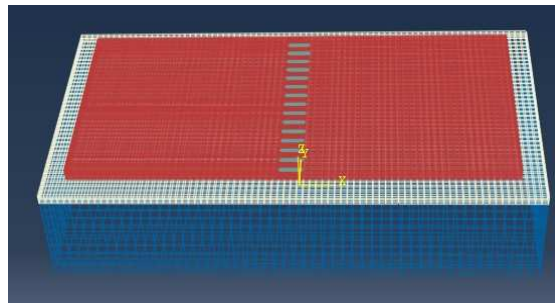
3-D FE Modeling of Dowel-Jointed Concrete Pavement
